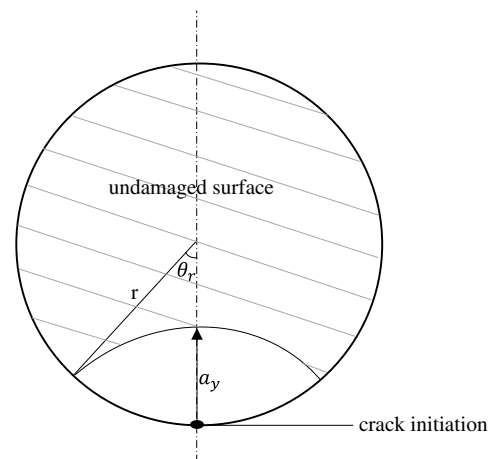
Crack growth on a reinforcing bar cross section.
